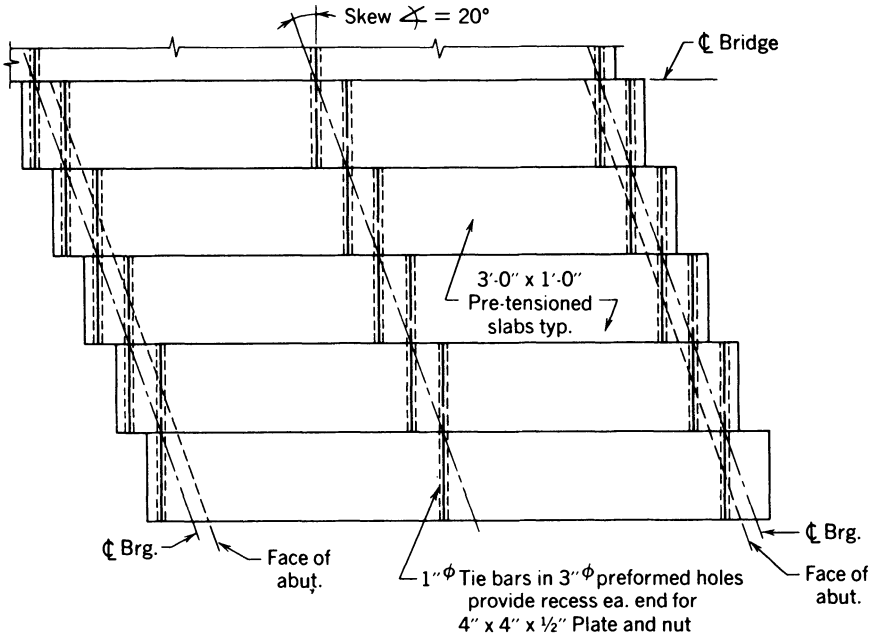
Half-plan of skewed bridge showing staggered transverse tie-bar layout.
